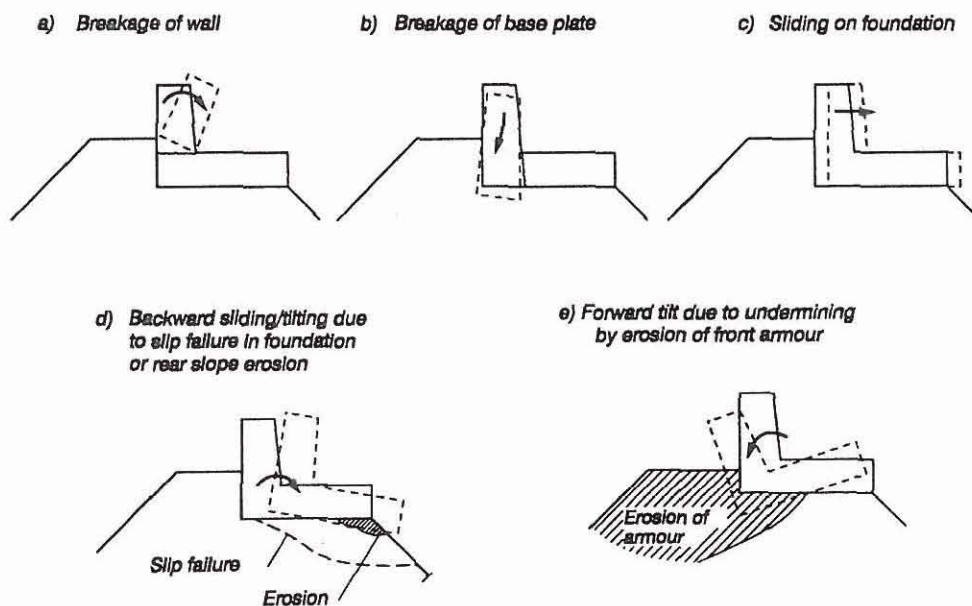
Common failure modes for concrete crown walls (taken from Burcharth (1993)).
